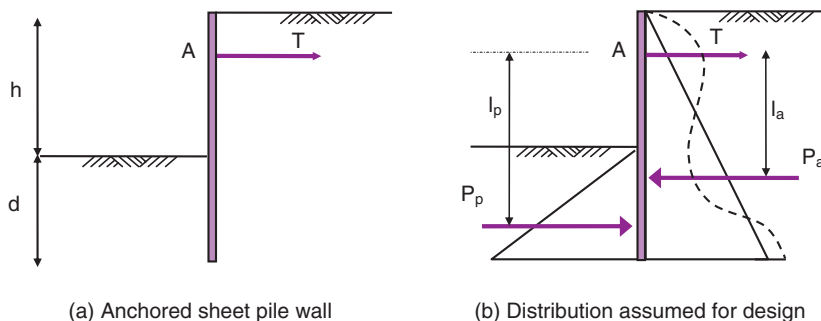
Free earth support method for anchored sheet piled walls.
